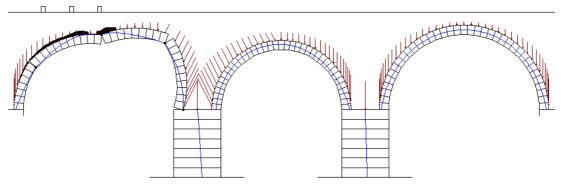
Minimum load failure mechanism of Negrelos Bridge.
